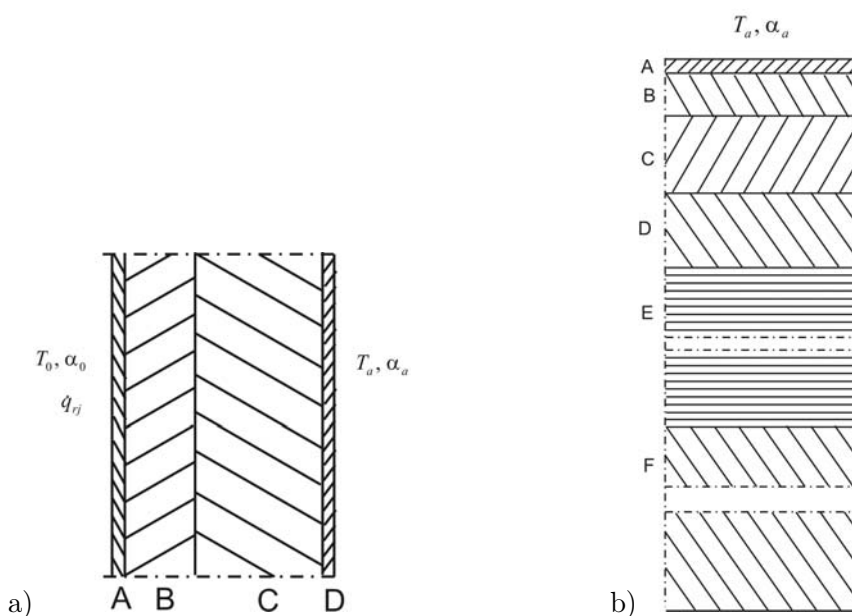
Repetitive element a) of the building walls: A, D – plasters, B – thermal insulation, C – Porotherm wall; b) of the subsystem floor-ground: A, – terracotta, B – jointless floor, C – thermal insulation, D – lean concrete, E – sand, F – ground.
